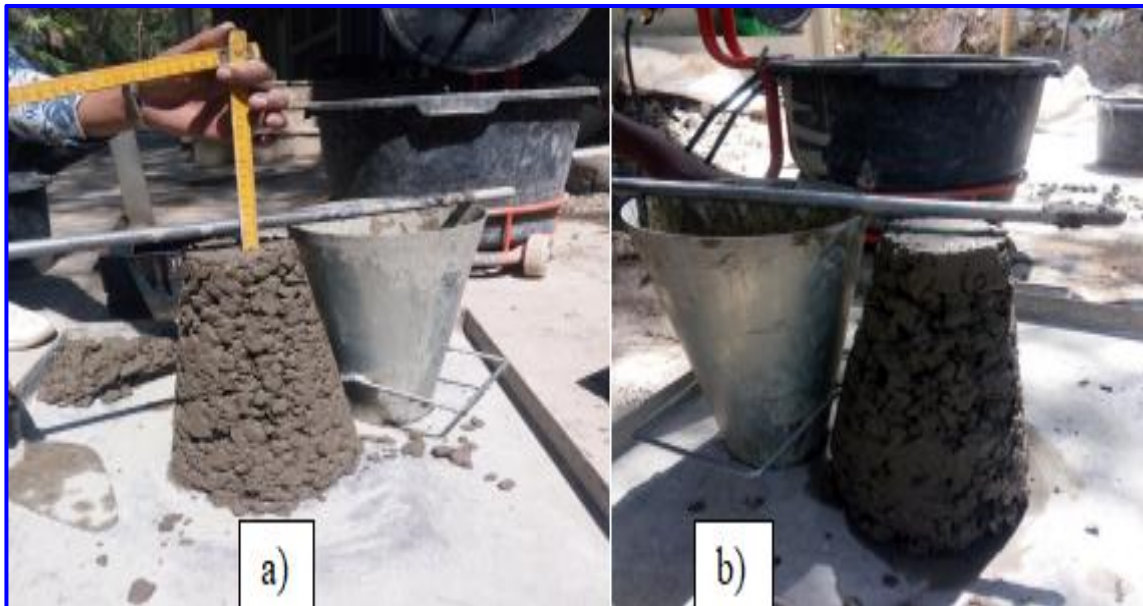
Slump Test a) Bacterial Concrete, b) Conventional Concrete
